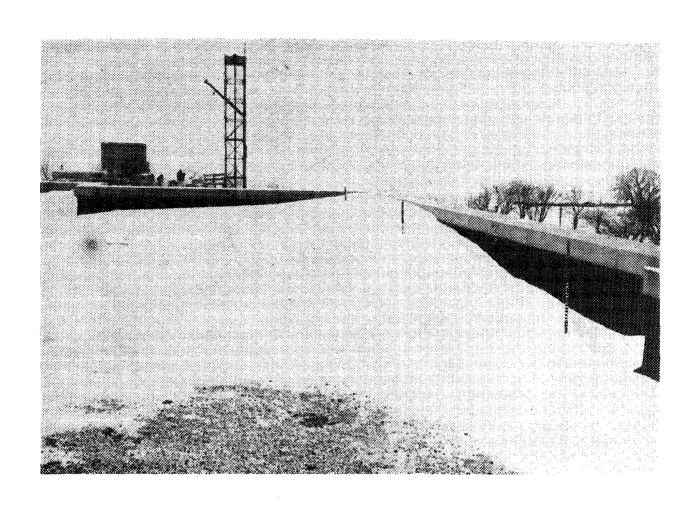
Churchill, Man. (January 13, 1958) Building J-85, looking NE. Snow accumulation on lower roof (main roof is bare).
